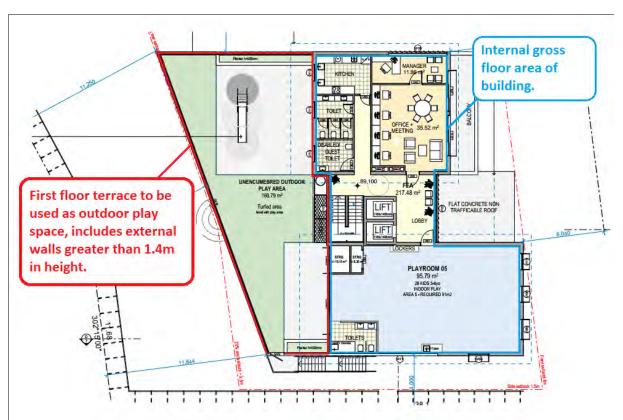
Areas included in GFA at first floor plan. Source: Designcorp Architects, 25 June 2020
